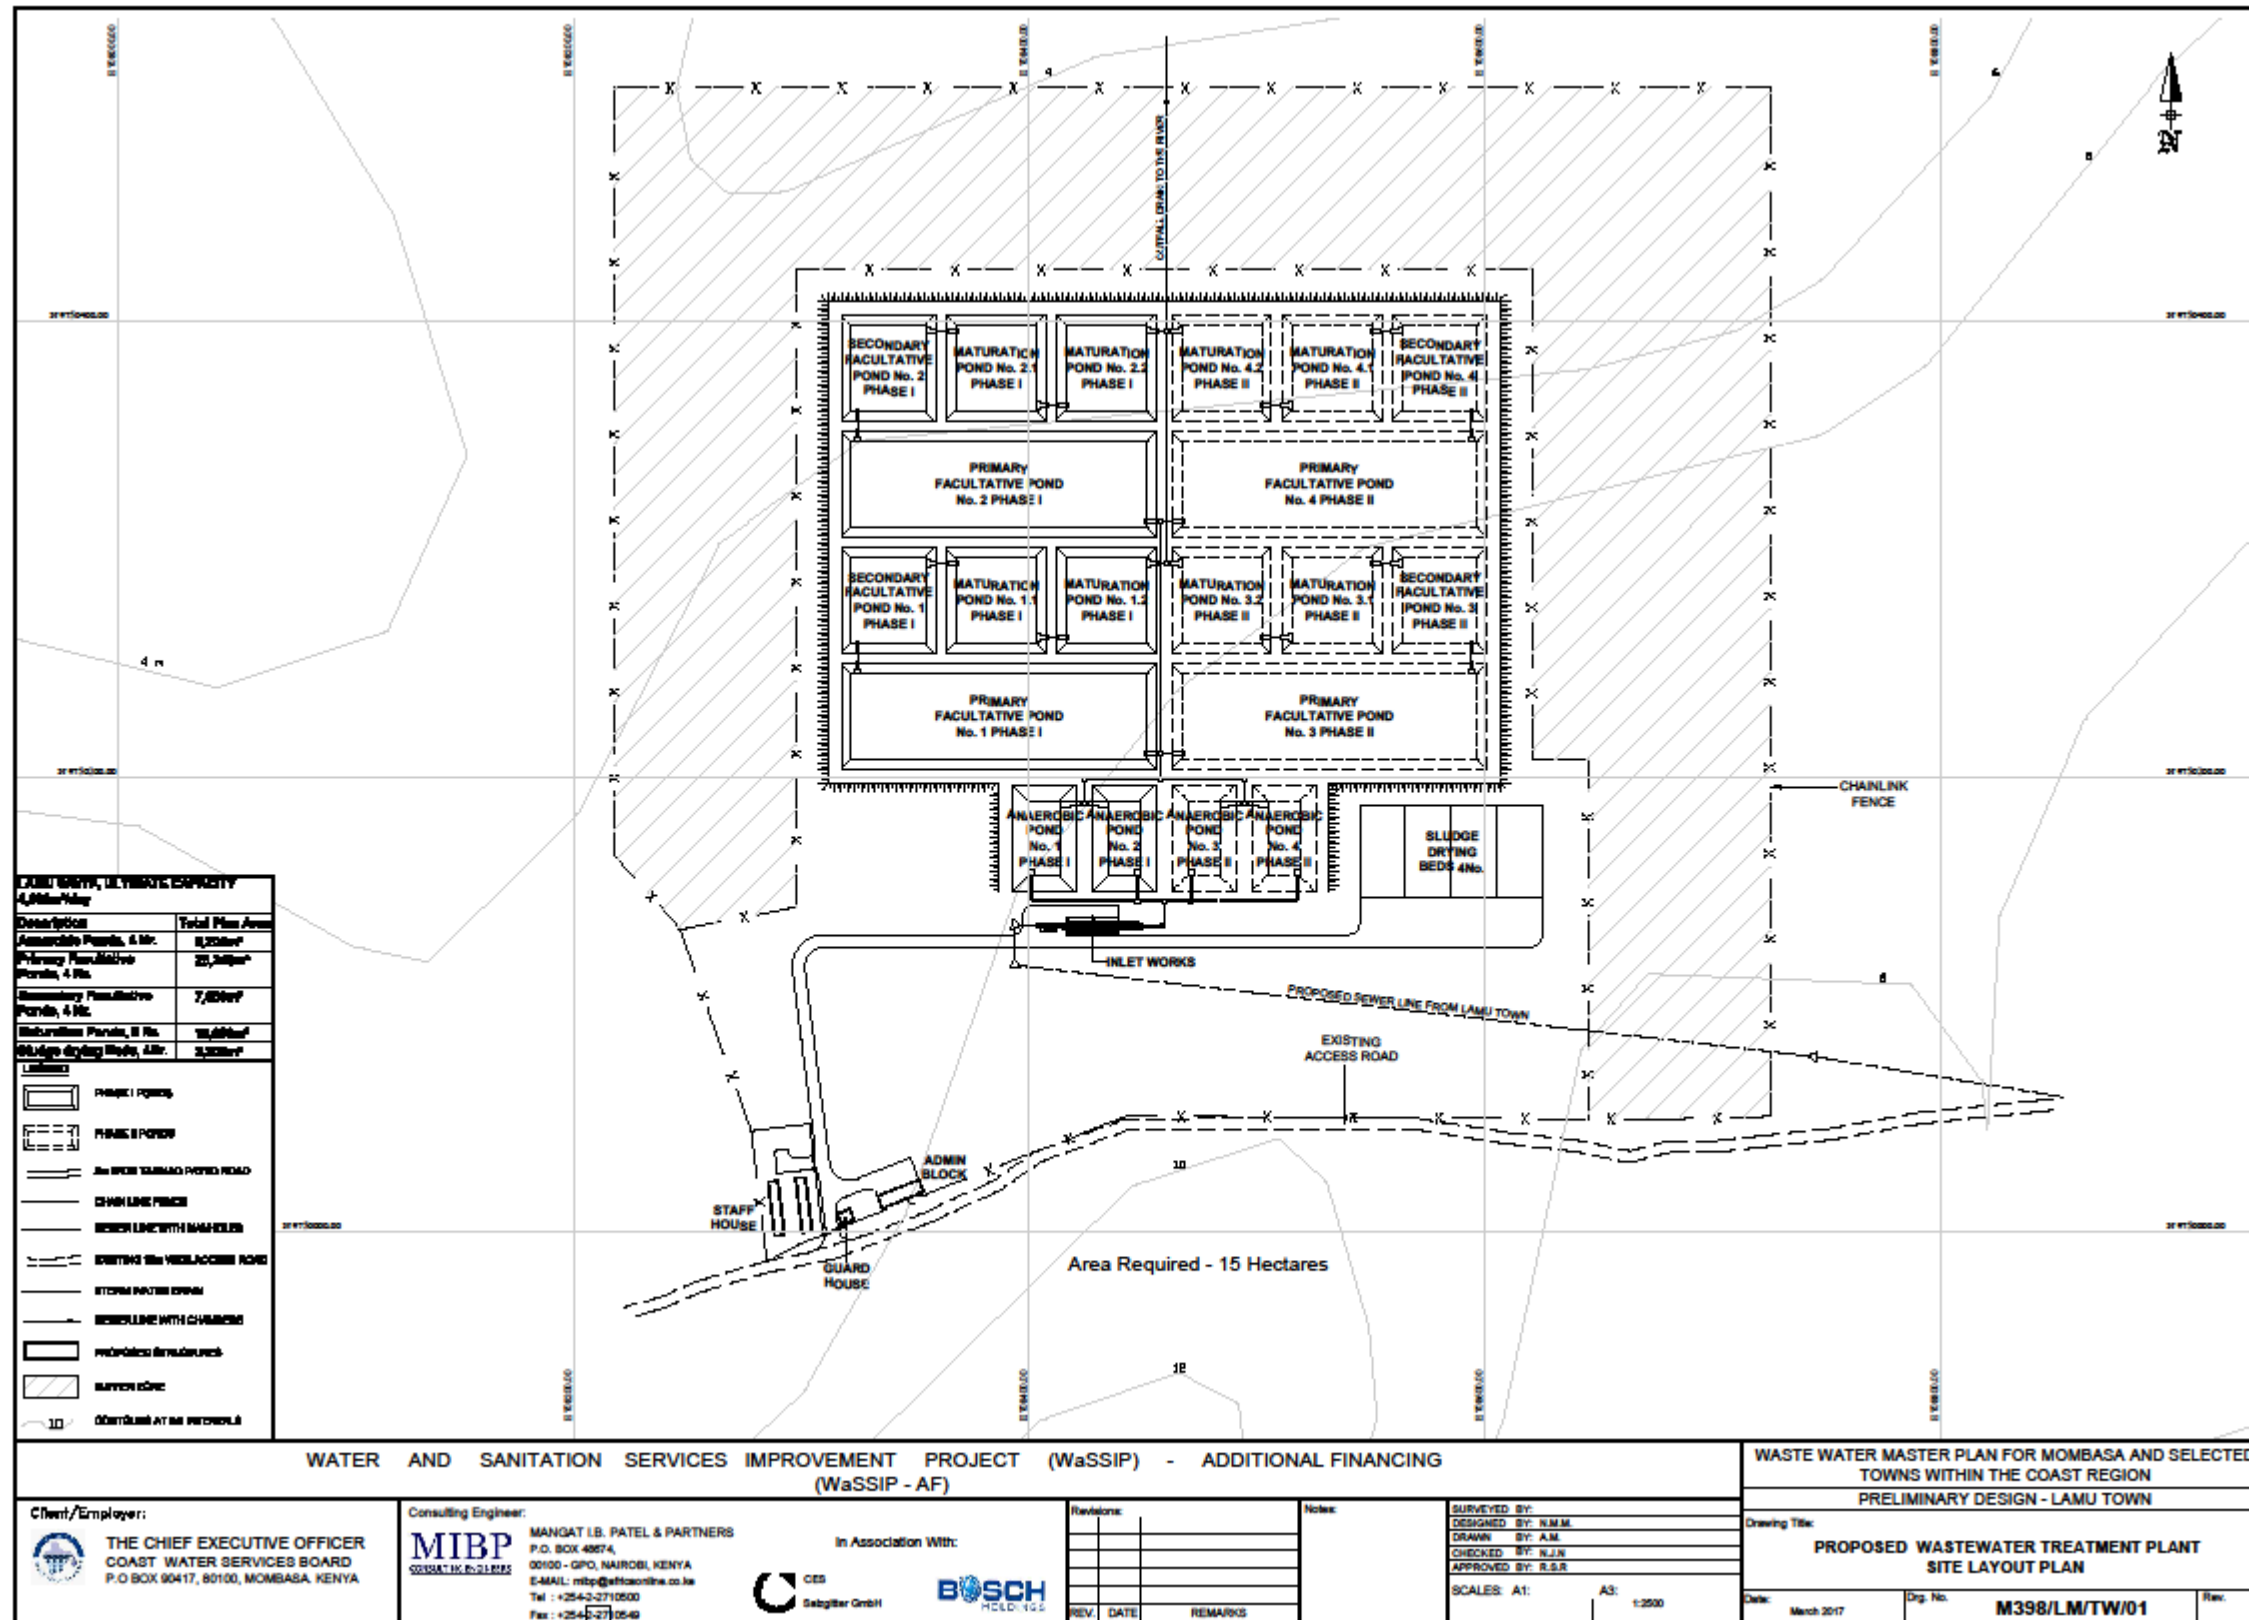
Site Layout Plan of the Proposed Wastewater Treatment Plant
